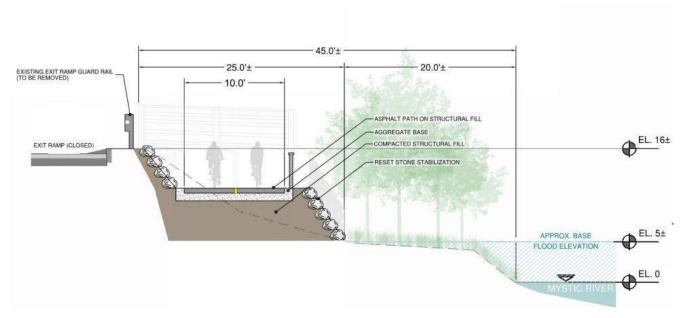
Section View of Alternative A0 - Ramp Closed, Path Transition up to Route 16 Exit Ramp
